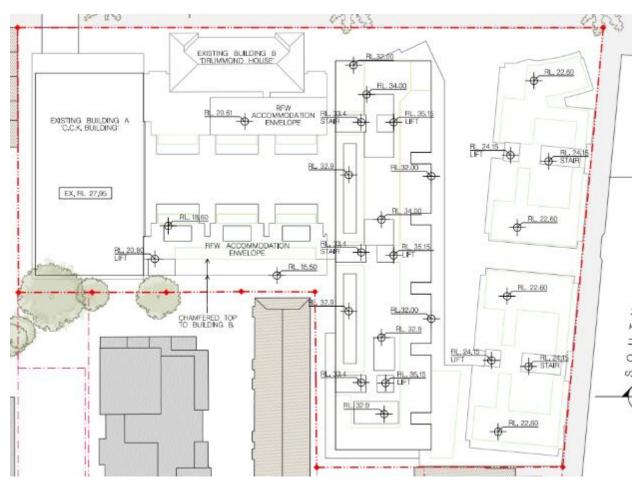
Proposed building heights (plan extract S75W – 1012)
